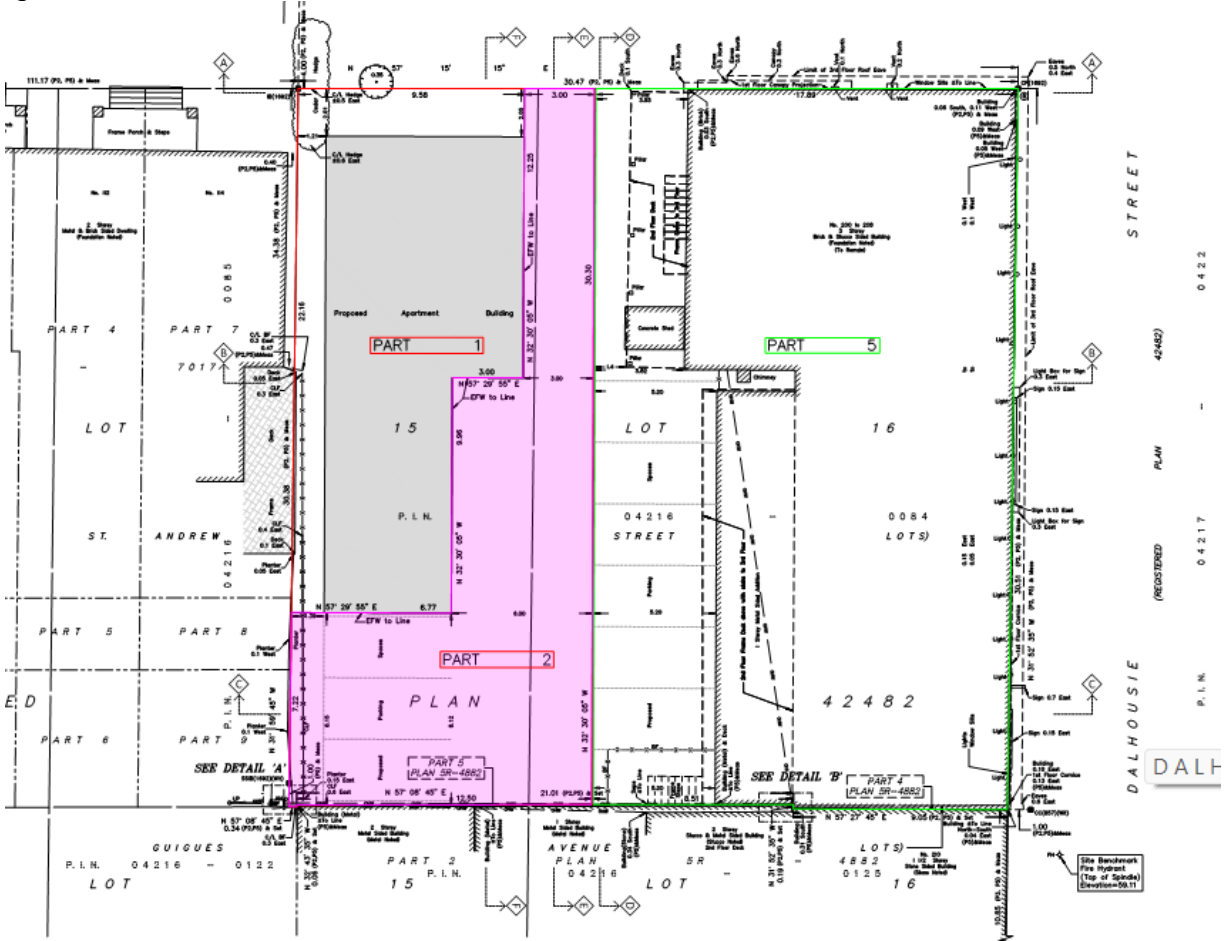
Consent Applications, Elevation 61.00 to 71.00 (no easements proposed at this elevation)
